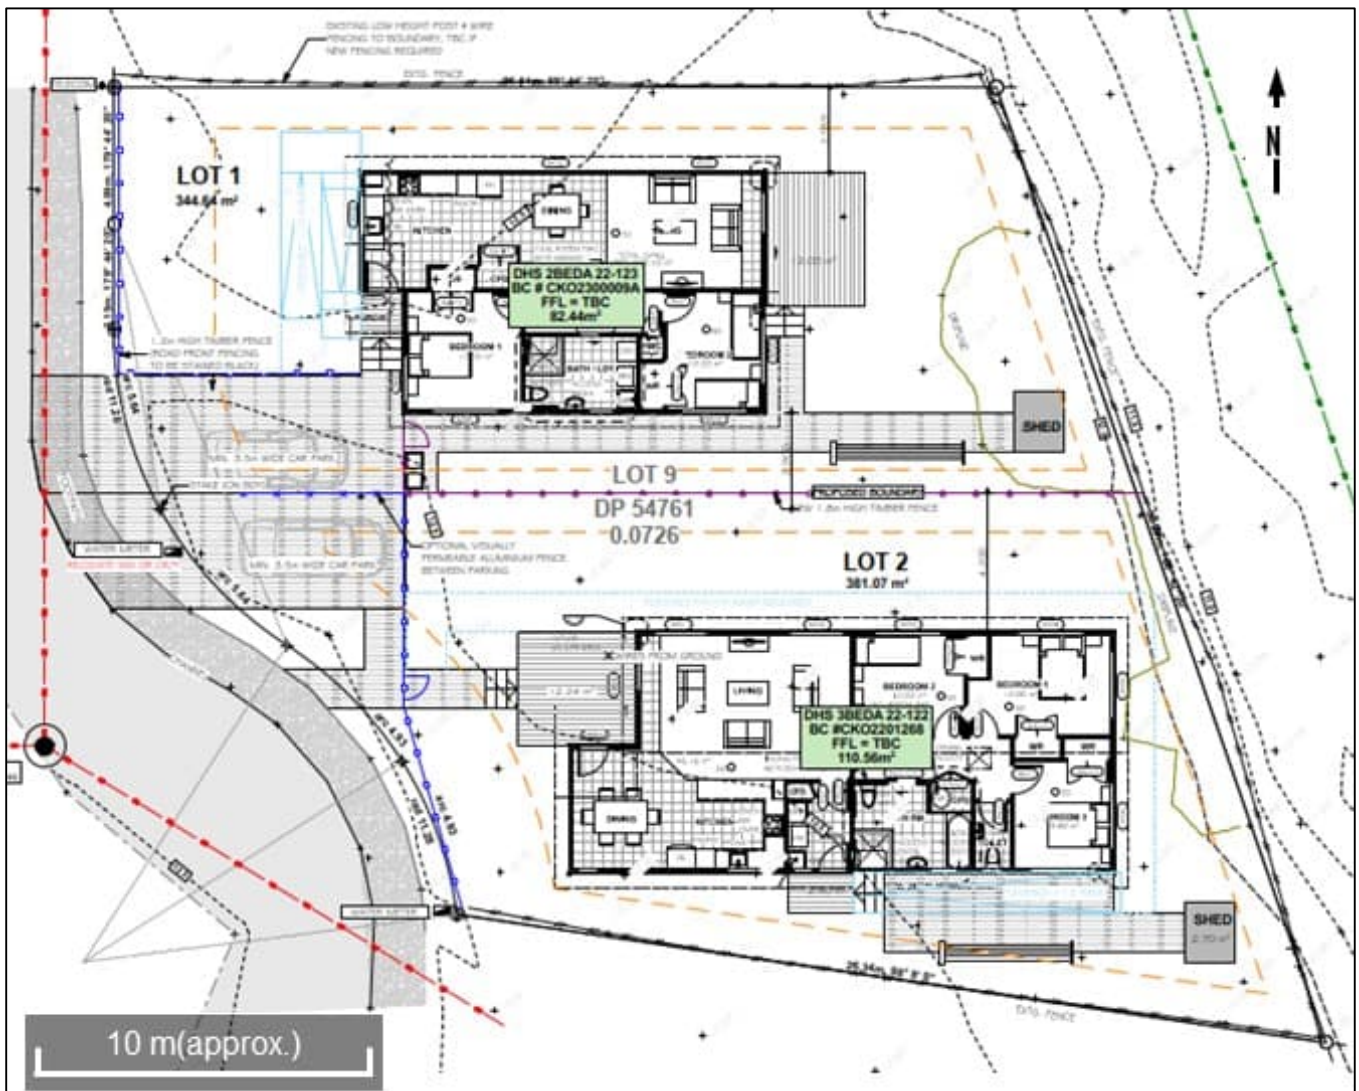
Image of draft Scheme Plan, showing proposed set out at 1 Masters Place, Kaitia<sup>2</sup>.
